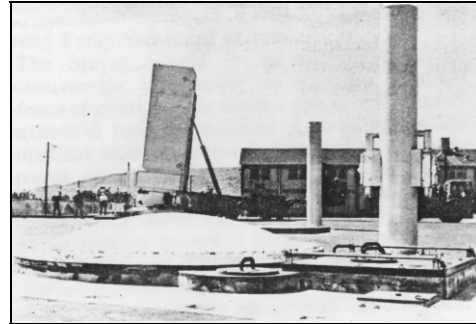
Sprint launch station at SMTF. Universal transporter loader and Building 1094 in background.
